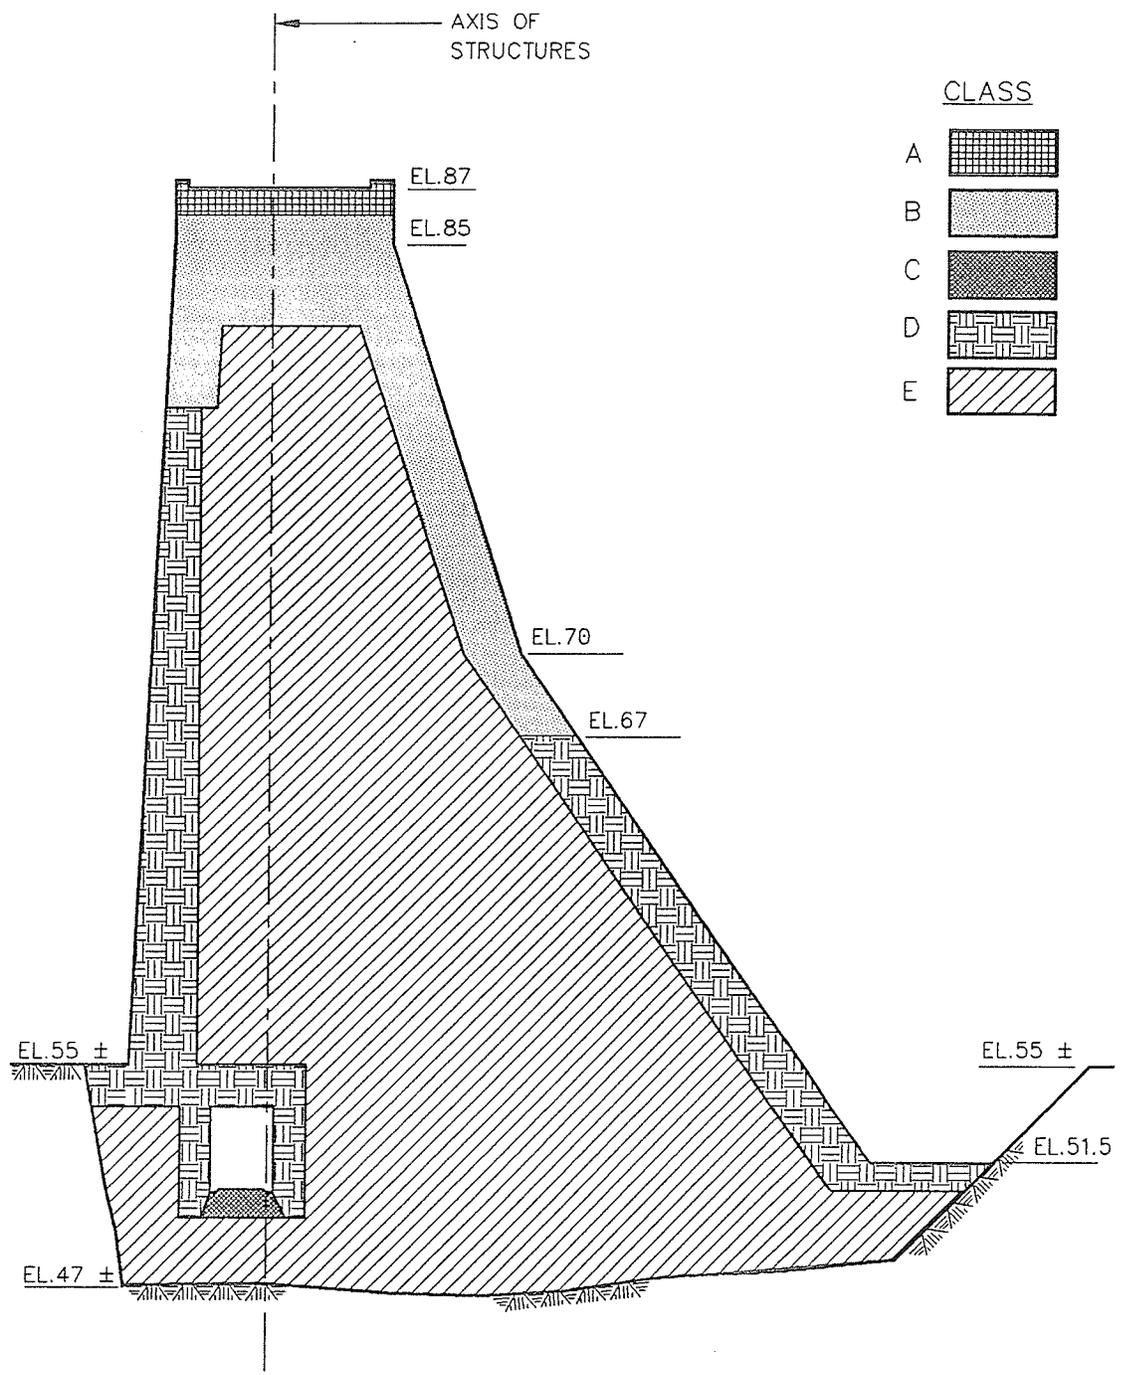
As-Built Concrete Mix Classes for Case Study Structure
